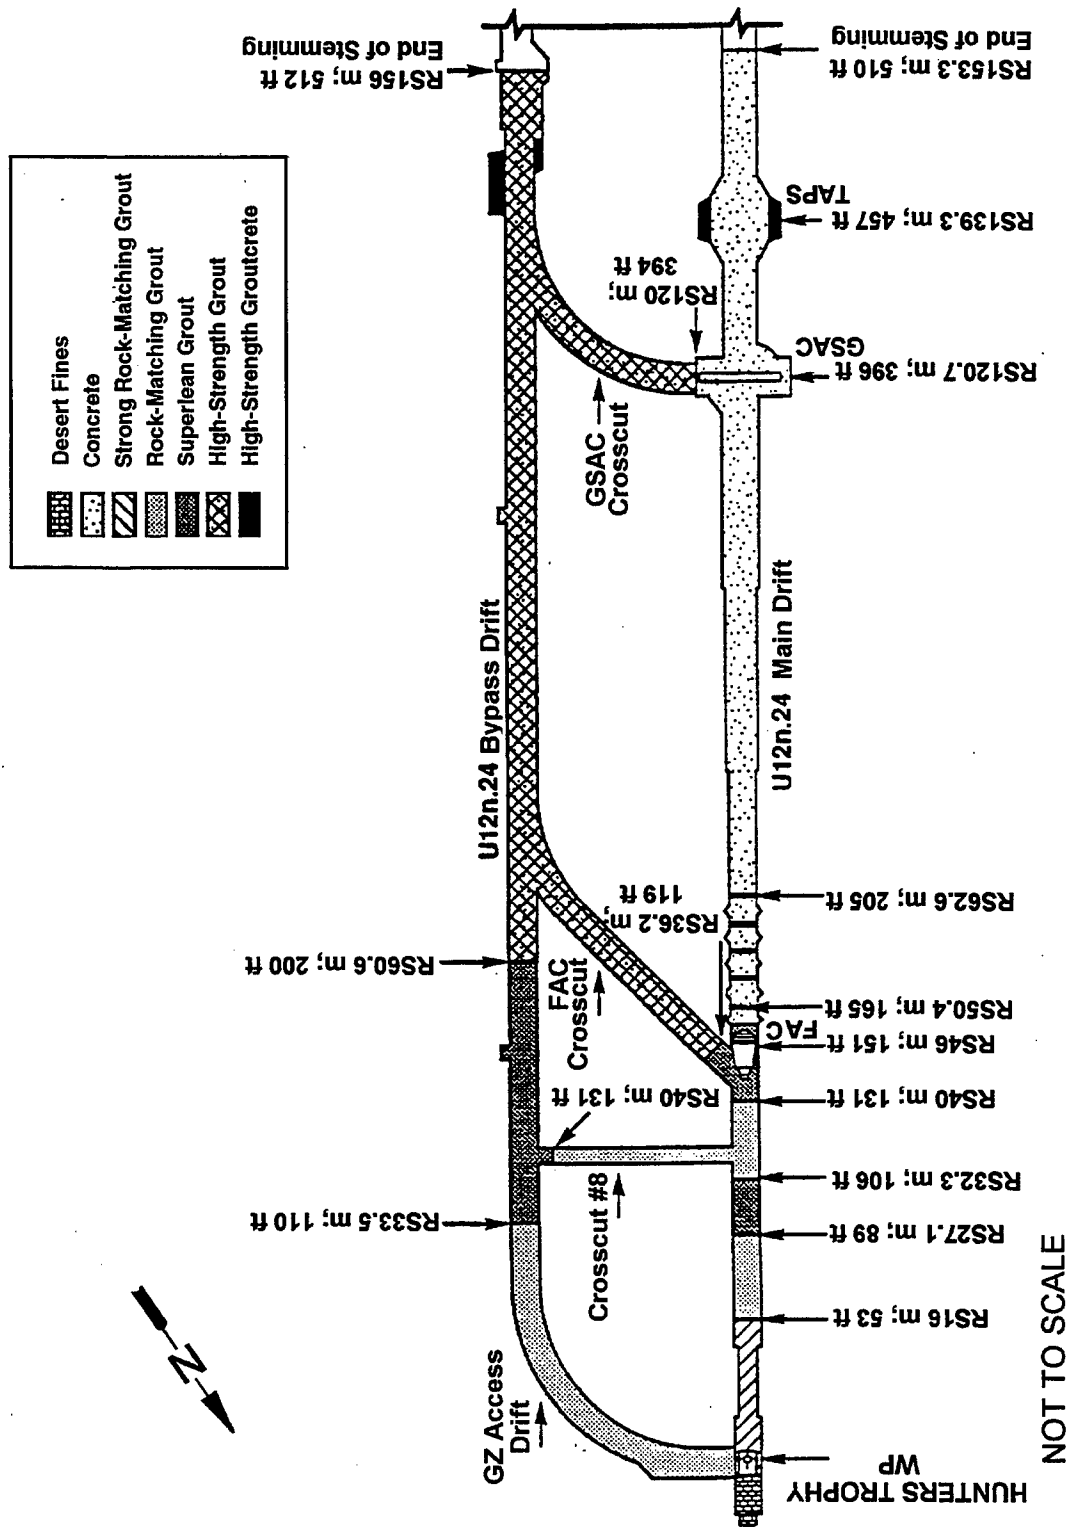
HUNTERS TROPHY test - stemming plan.
